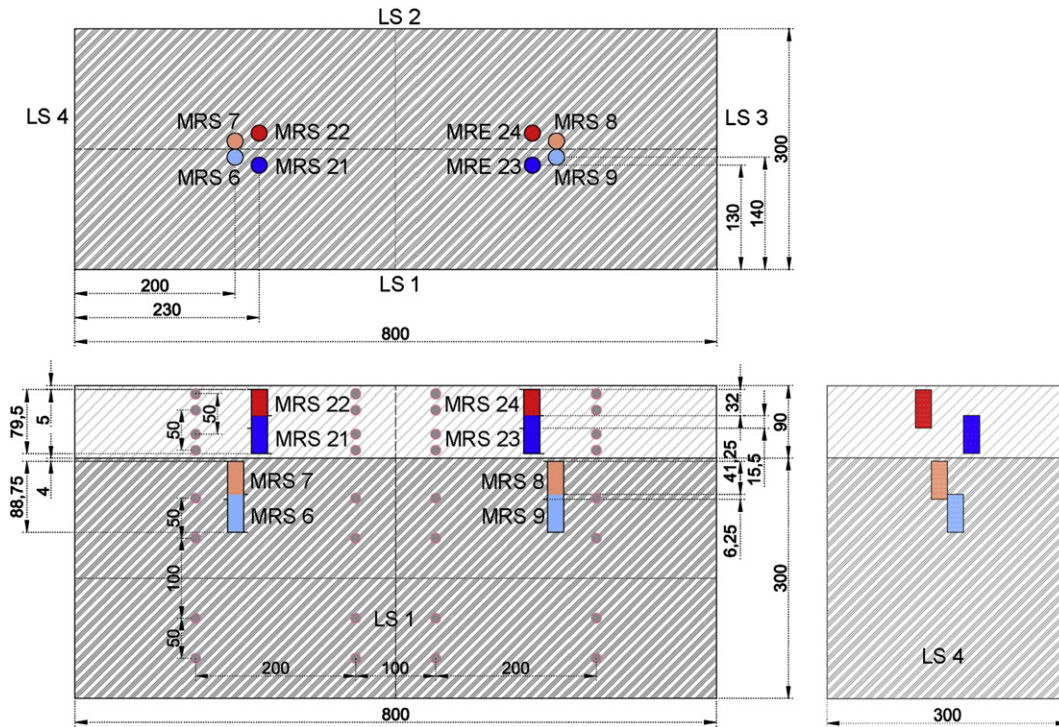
Arrangement of MRS and measuring discs in the brick-shaped specimen and in the concrete overlay.
